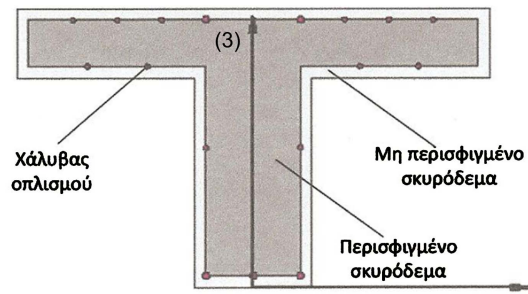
Beam cross section. Three different materials are distinguished reinforcing steel, non-reinforced concrete, reinforced concrete.
